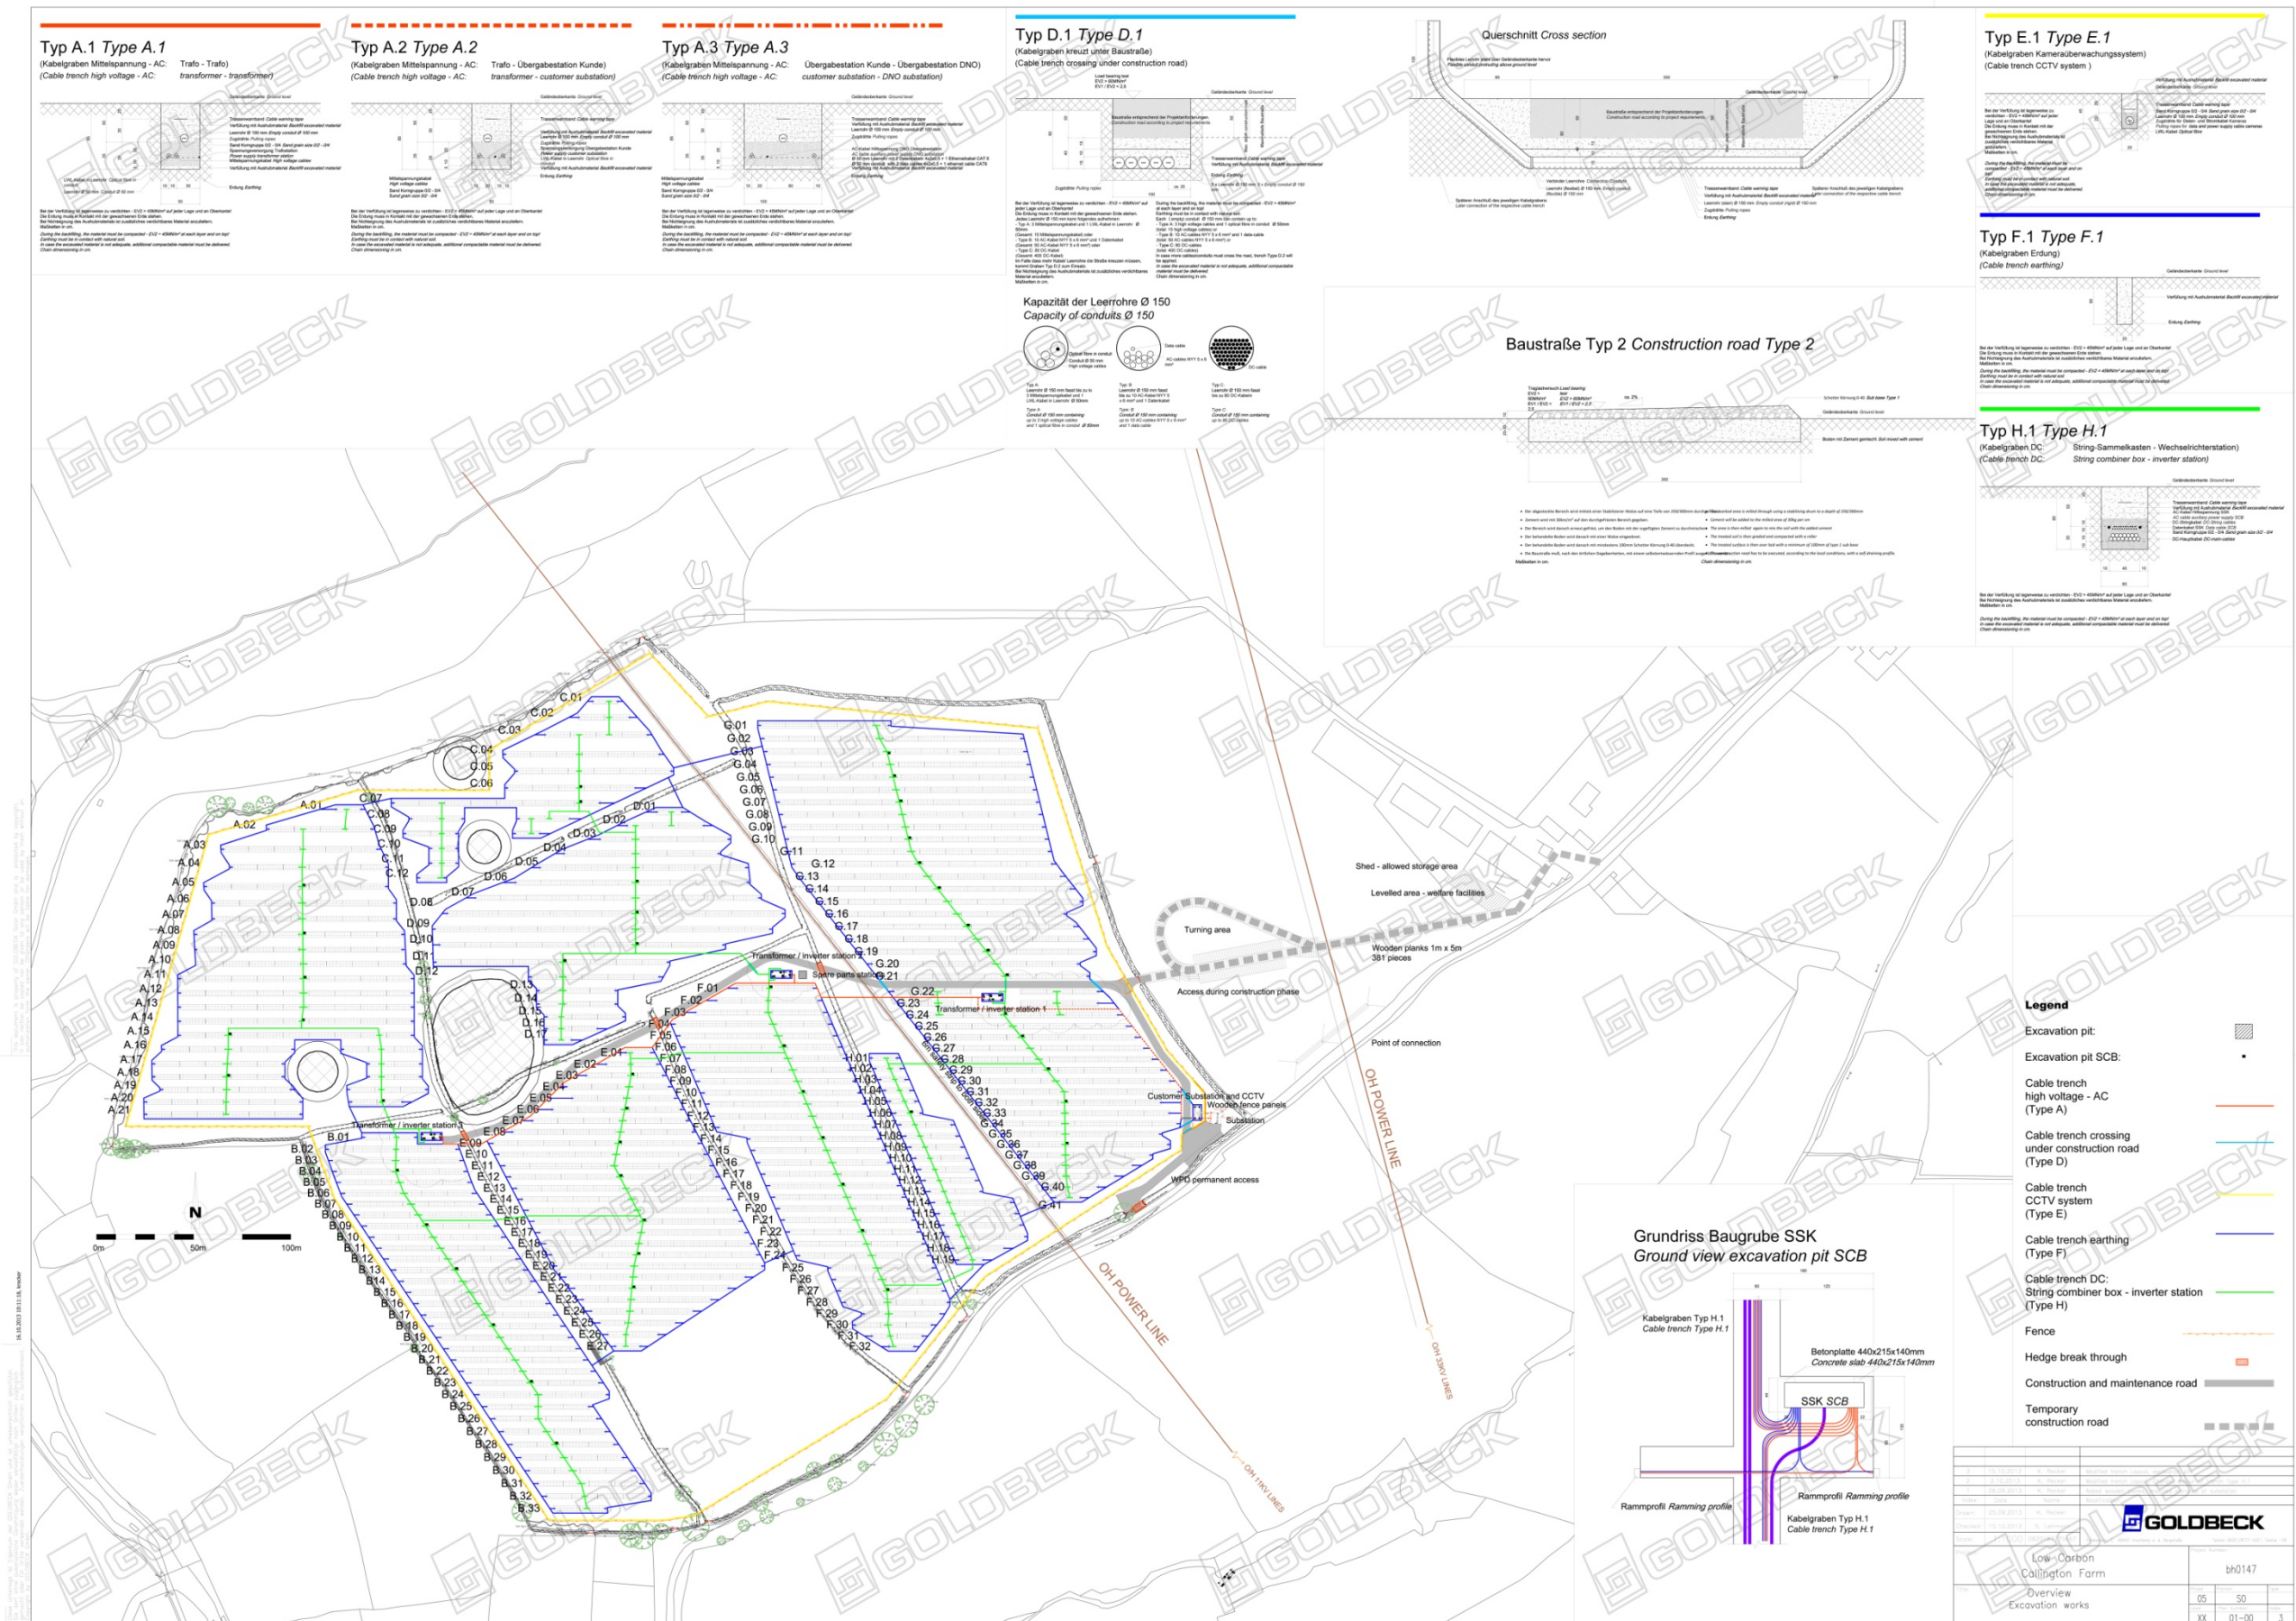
Site plan showing the solar panel layout mitigating the recommended archaeological constraints resulting from geophysical survey. Plan also shows cable duct trenches and cable duct section profiles. Plan © Goldbeck Dwg. Bh0147 01-00 'Overview Excavation works Dated 15/10/2013.
